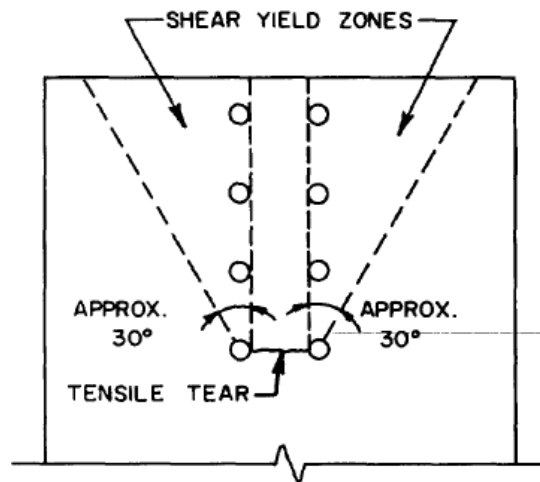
Common failure mode for tension gusset plates (from Hardash and Bjorhovde 1985). Copyright © American Institute of Steel Construction. Reprinted with permission. All rights reserved.
